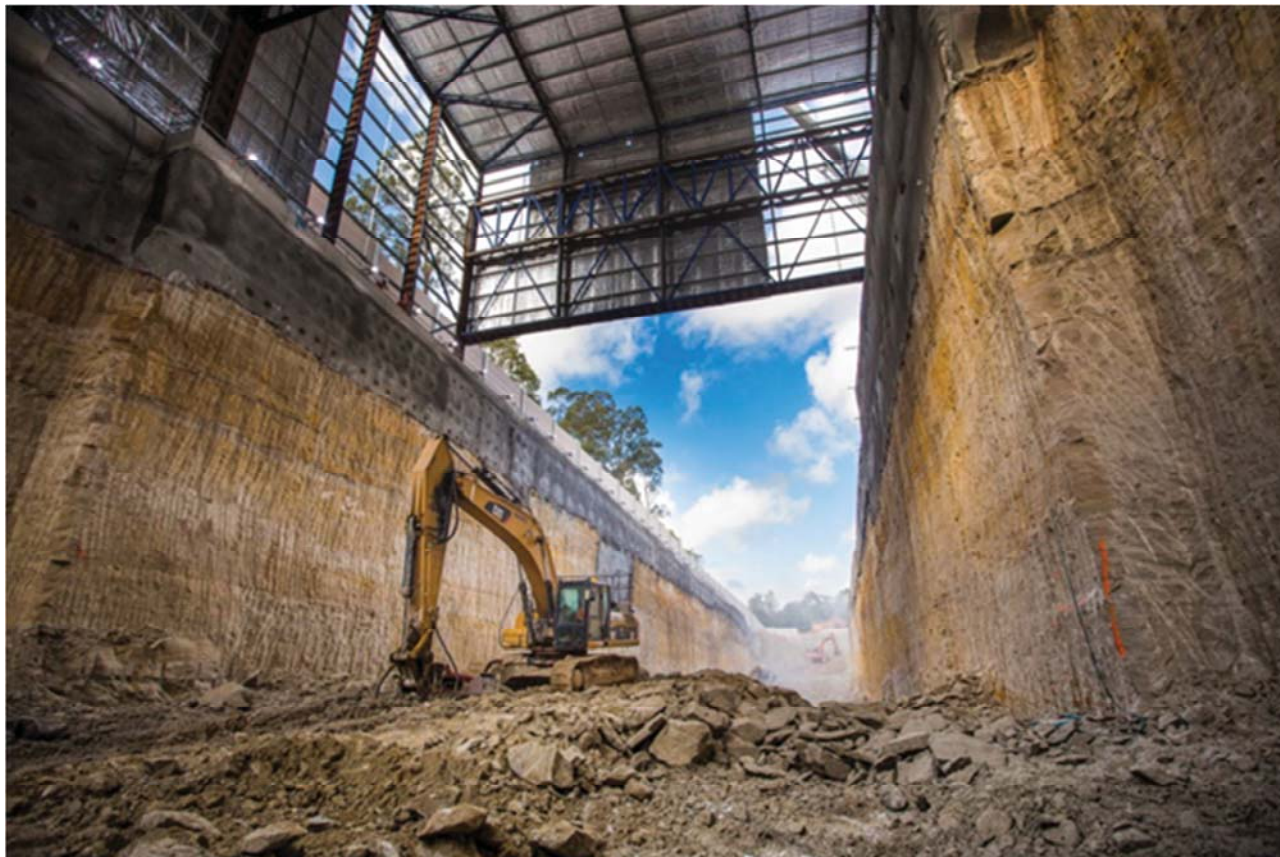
Spoil and Excavation Works at the Showground Station Site
